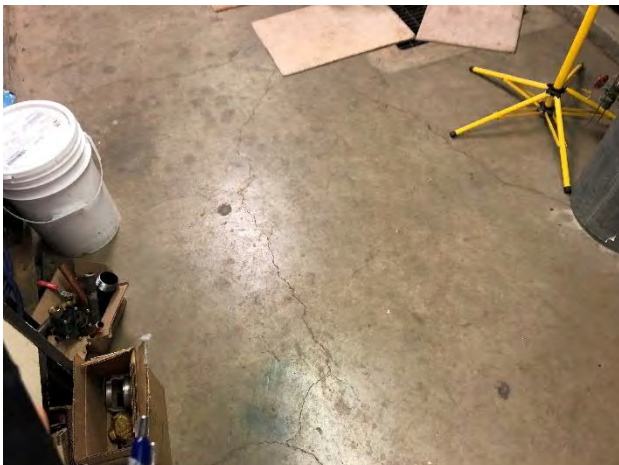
Typical Crack in Main Mechanical Room Slab
